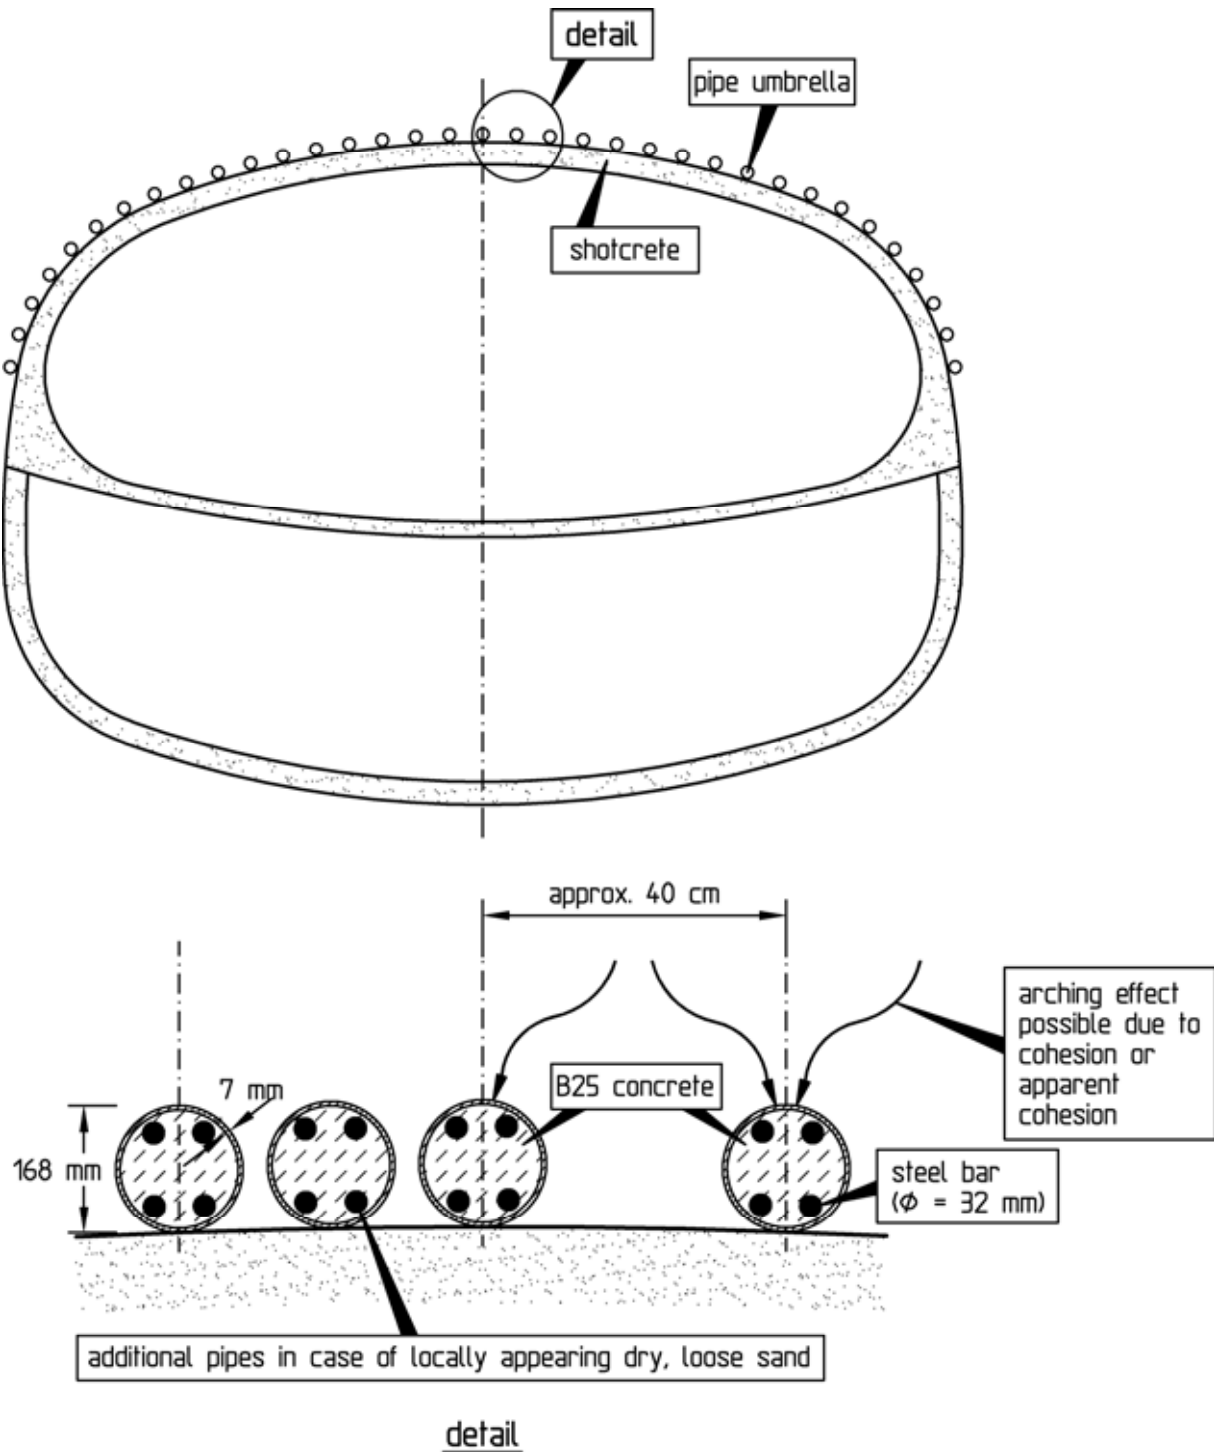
Elite Tunnel, contractor's design proposal, cross-section with pipe umbrella and detail
